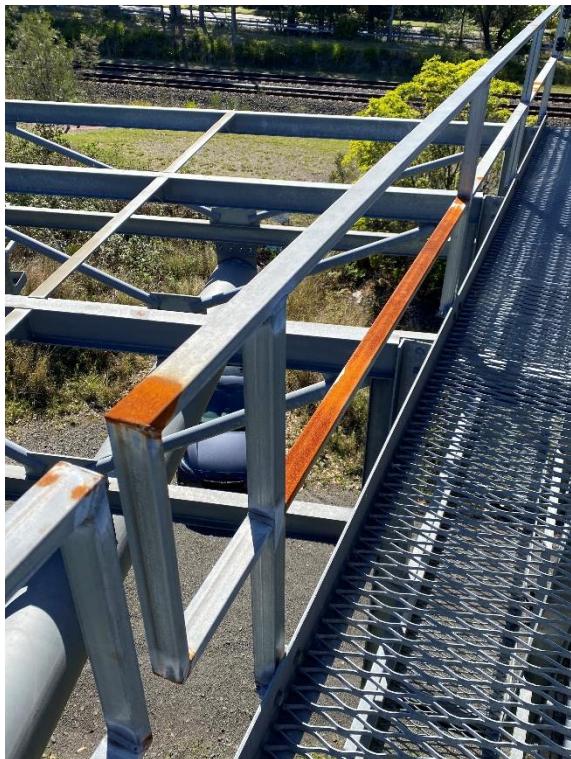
Surface corrosion to handrailing (inbound side).
